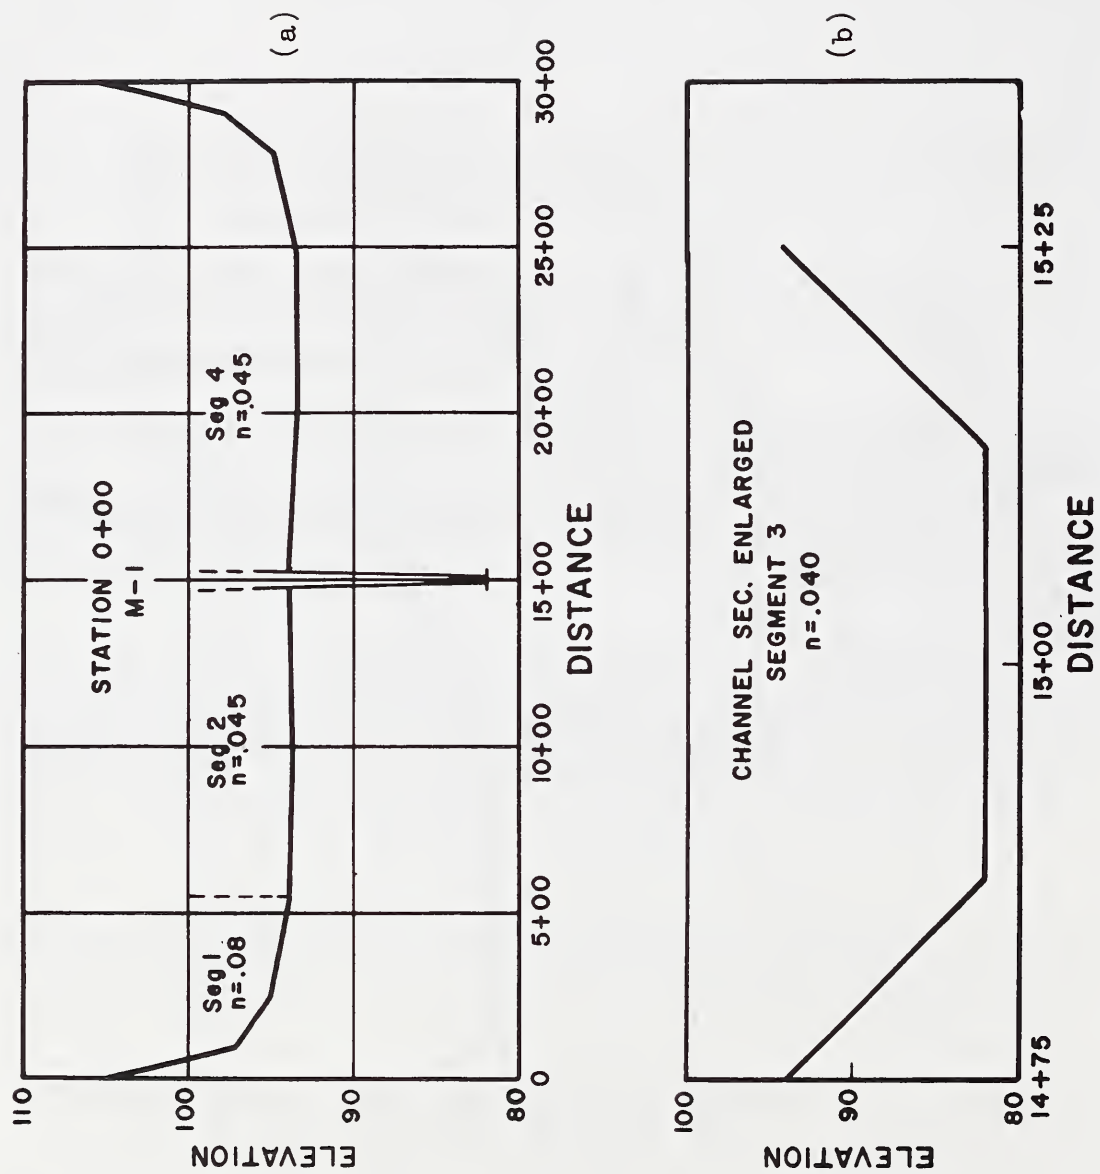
; Cross section M-1, Examples 14-4 and 14-5.
